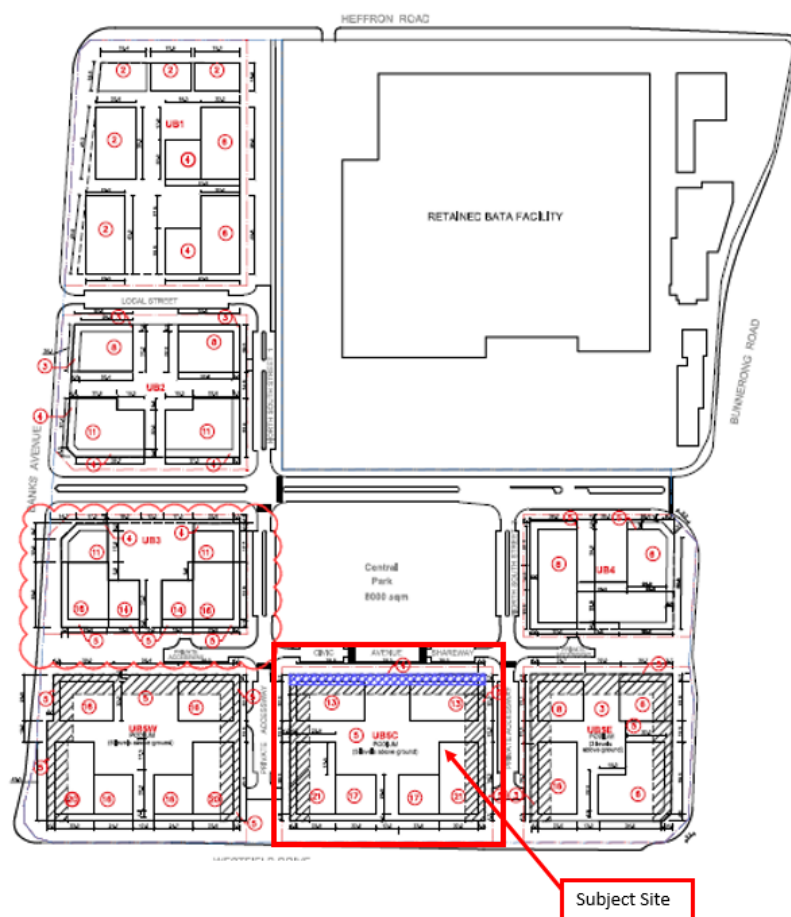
Building envelope plan of the Stage 1 consent determined as part of DA-14/96/02 and 14/96/07
